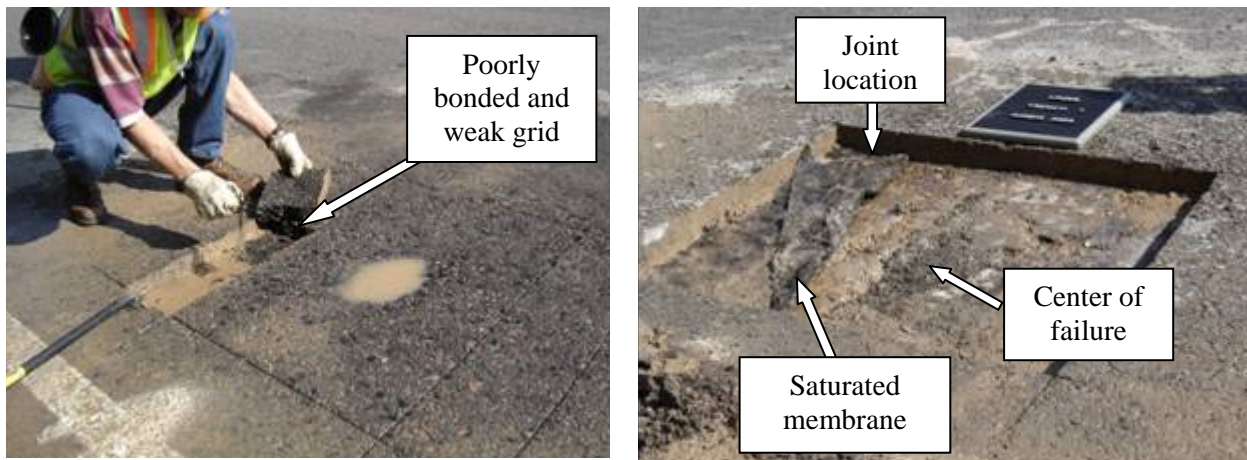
Photographs of a Trench at a Failure on Loop 12.
